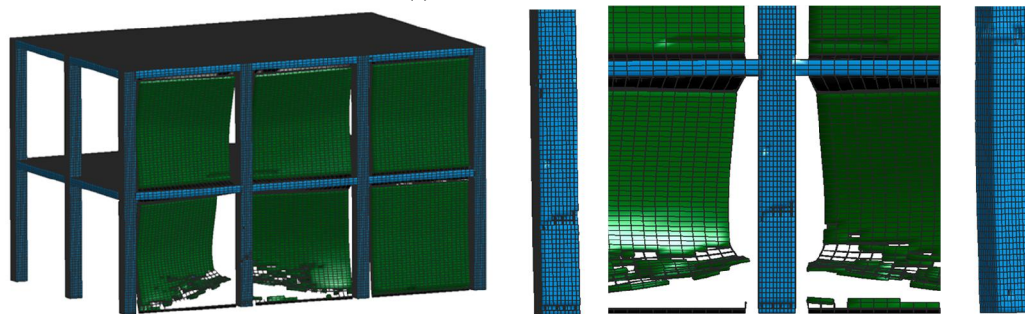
Damage pattern of building with walls connected from all directions due to blast 175 kg TNT at distance 2.50m
